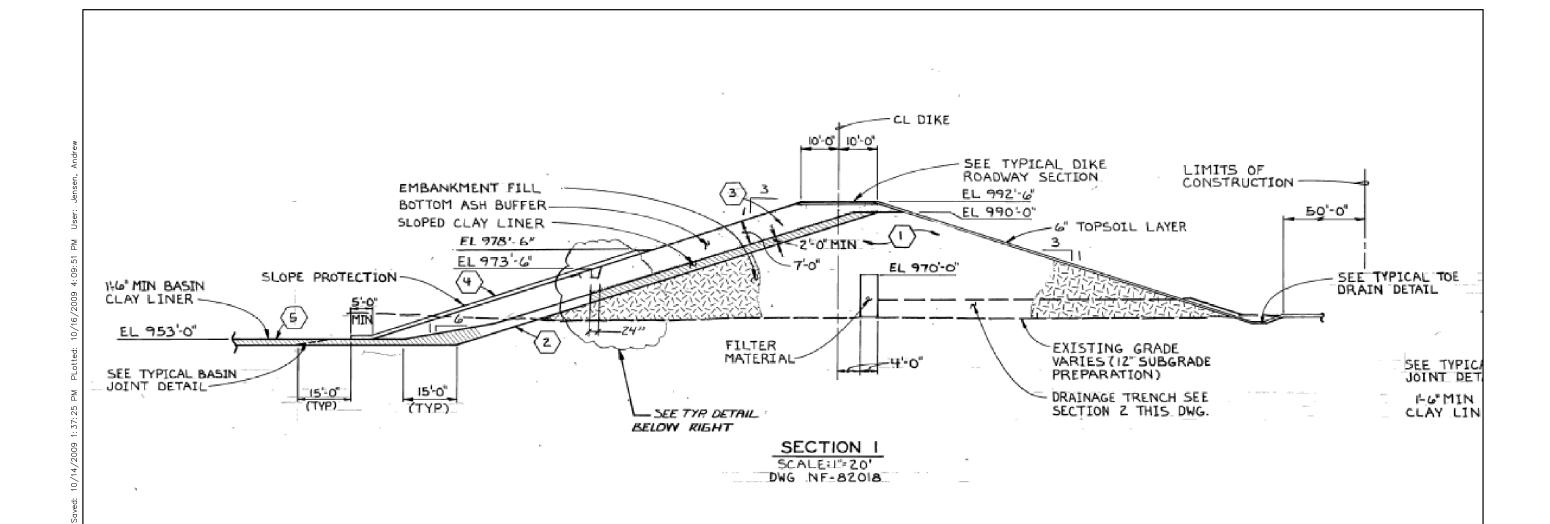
IMAGE REFERENCE: AS BUILT, REVISED DRAWING PER DWP SC-92-254, DWN: 3-6-95, PROJ: E91N055, ASH STORAGE AREA SECTIONS AND DETAILS
